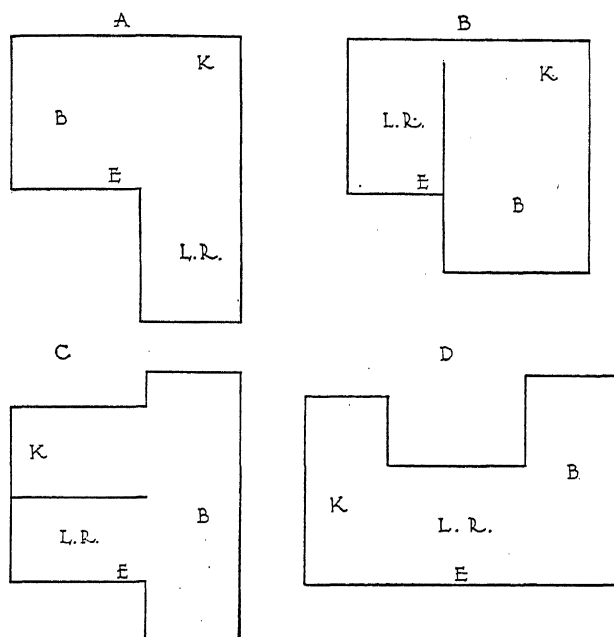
Suggested shapes and space divisions for a larger one-story house.
